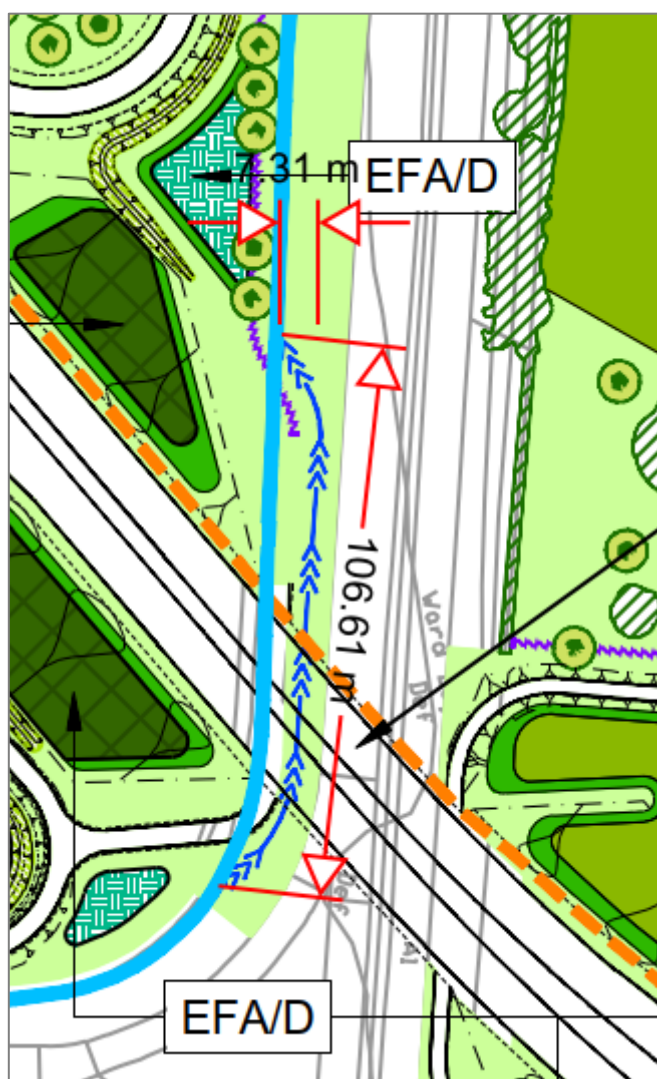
Slough Dyke realignment – extract from AS-007 (General Arrangement Plans) Sheet 25005
